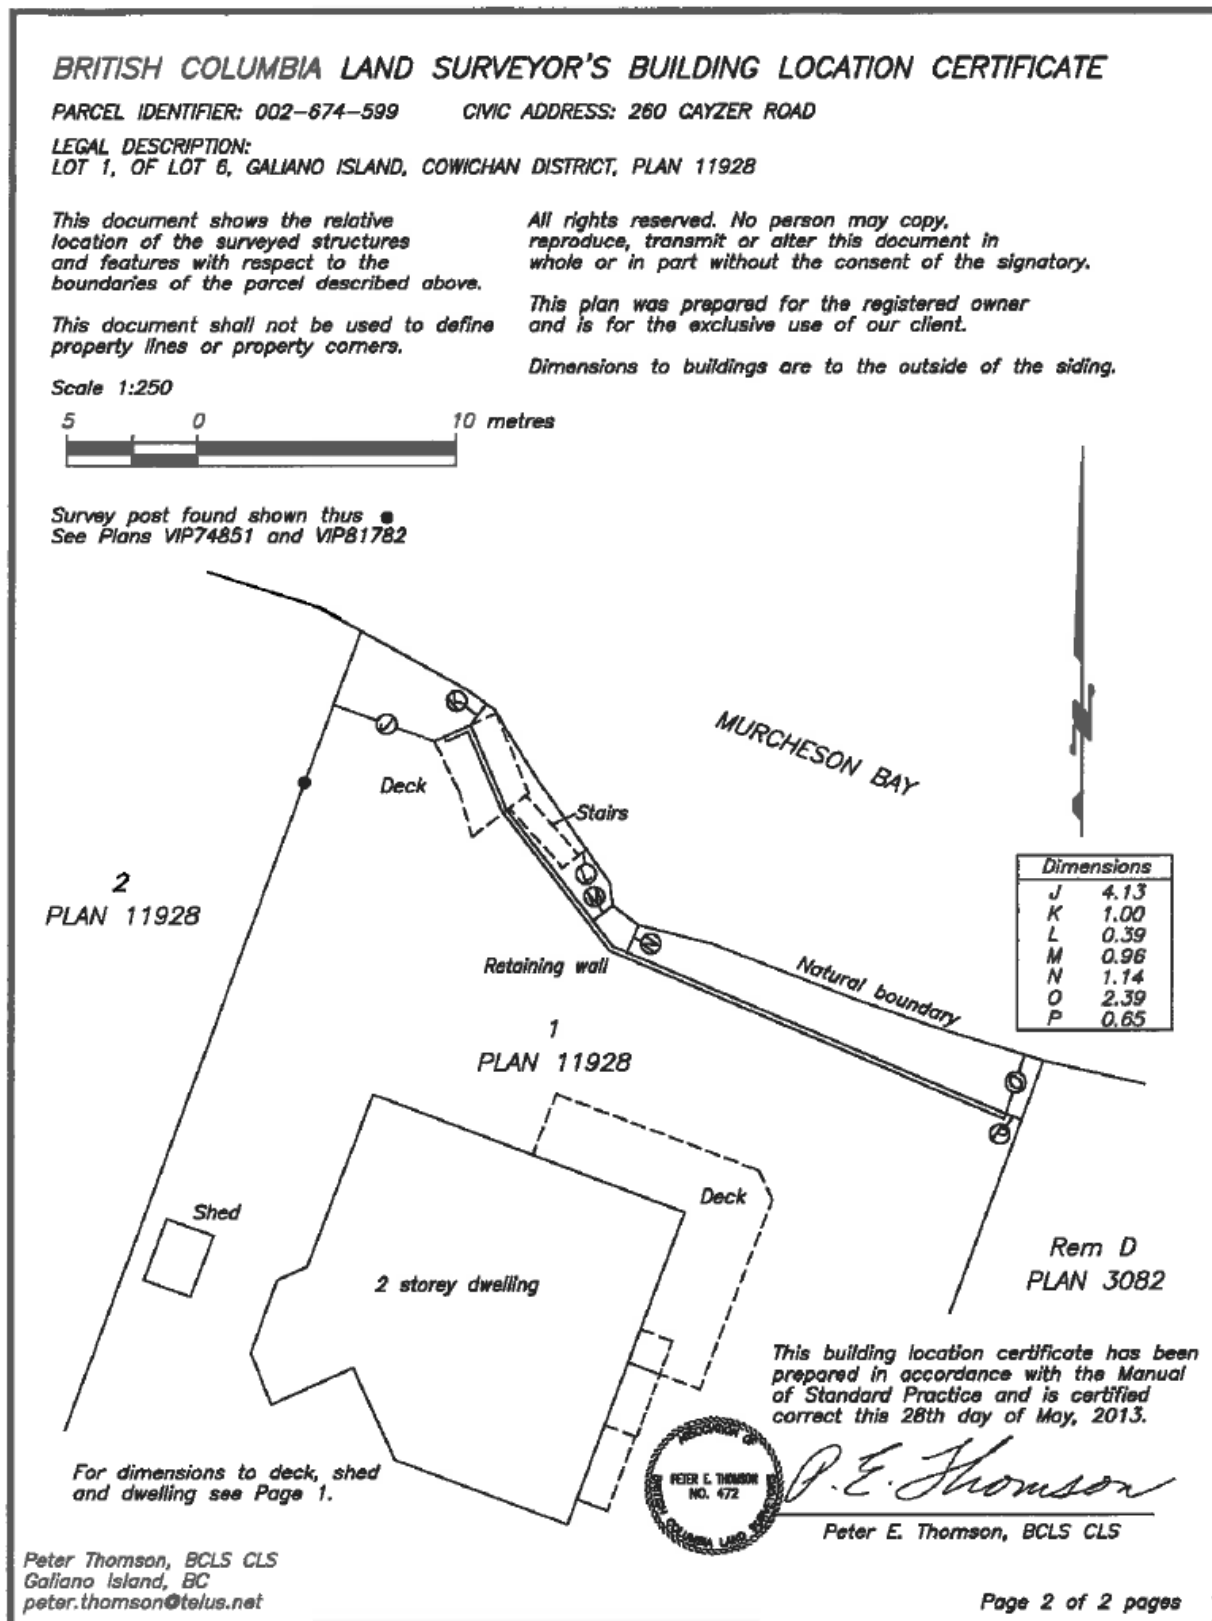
Survey Site Plan – Retaining Wall, Stairs, & Deck
